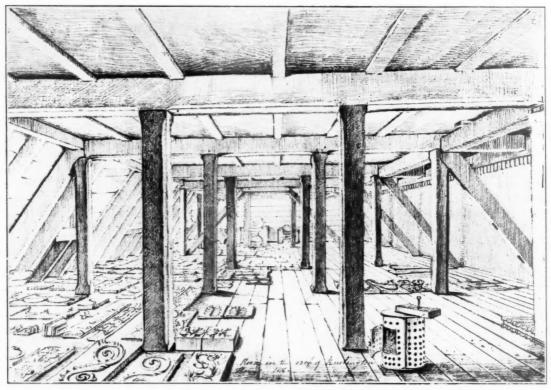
VIEW IN THE ATTIC ROOF OVER THE NORTH SIDE OF BURLINGTON HOUSE, LOOKING EAST. FROM A PENCIL DRAWING IN THE GARDNER COLLECTION (AUTHOR UNKNOWN), DATED 1816.
